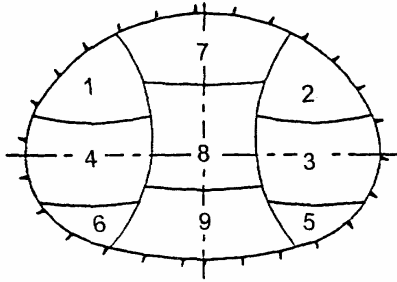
Twin side drift and central pillar excavation method. Temporary support consists of double wire mesh reinforced 250 - 300 mm thick shotcrete shells with embedded lattice girders or HEB 160 steel sets at 0.75 - 1 m spacing.
